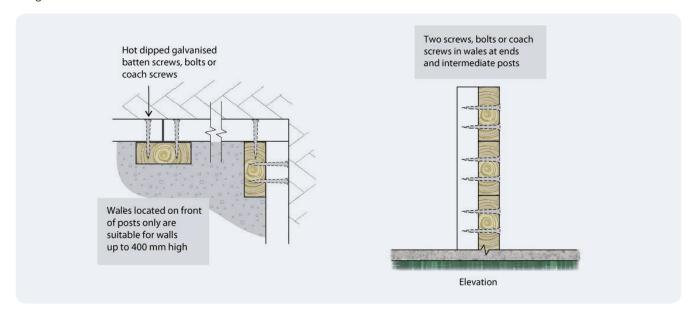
(a): Sleeper Post Arrangement (Inside Wall)
